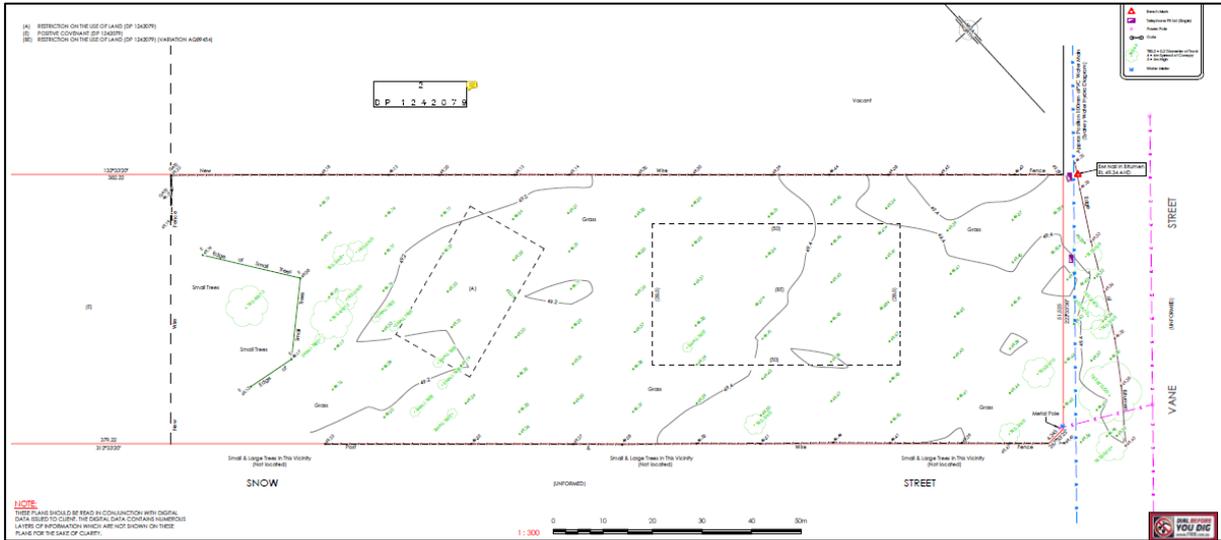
Existing site vegetation and proposed building envelope (Source: Freeburn Surveying)
